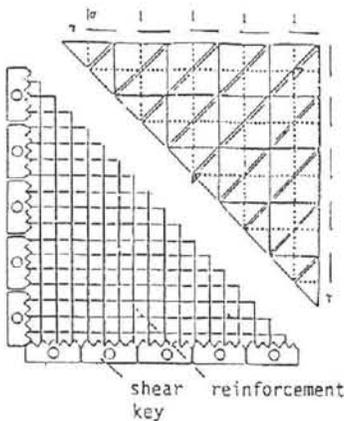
Reinforced Concrete Panel and Mesh Layout [2-26]
